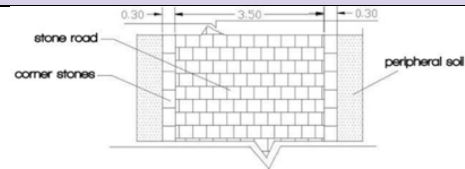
Top view of a stone road showing corner stones and peripheral soil boundaries.
